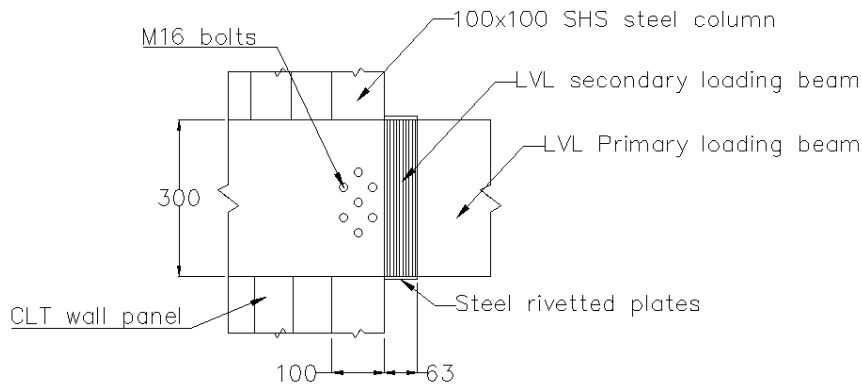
Bolted 'pin' connection between the loading beam and steel SHS corner column
